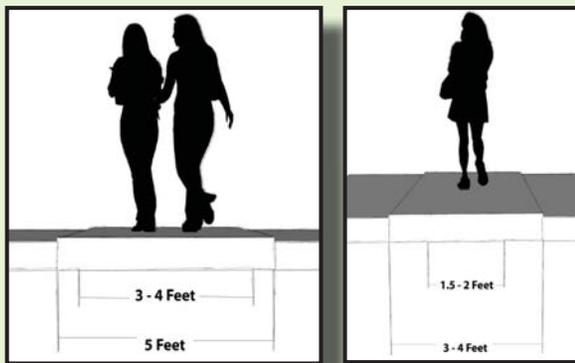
, 4.32 Minimum walking widths for single and double occupancy
